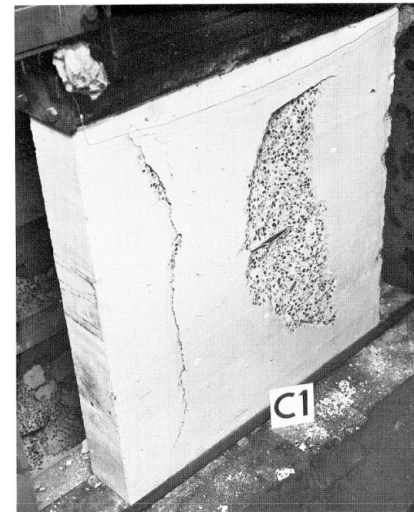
Slab-type lightweight concrete specimen after a fire test.
